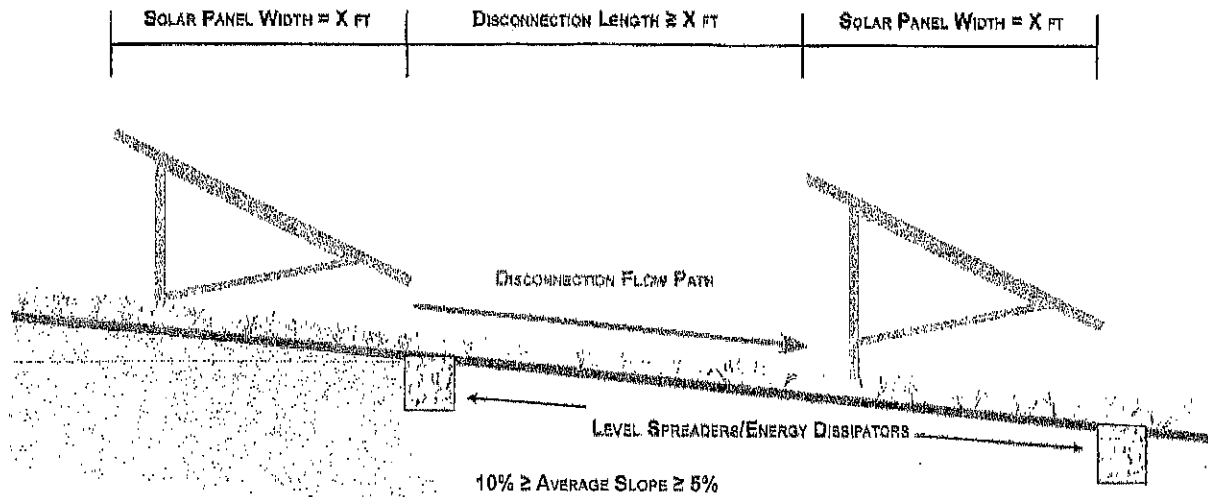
Typical Installation – Slope $\geq 5\%$ but $\leq 10\%$
